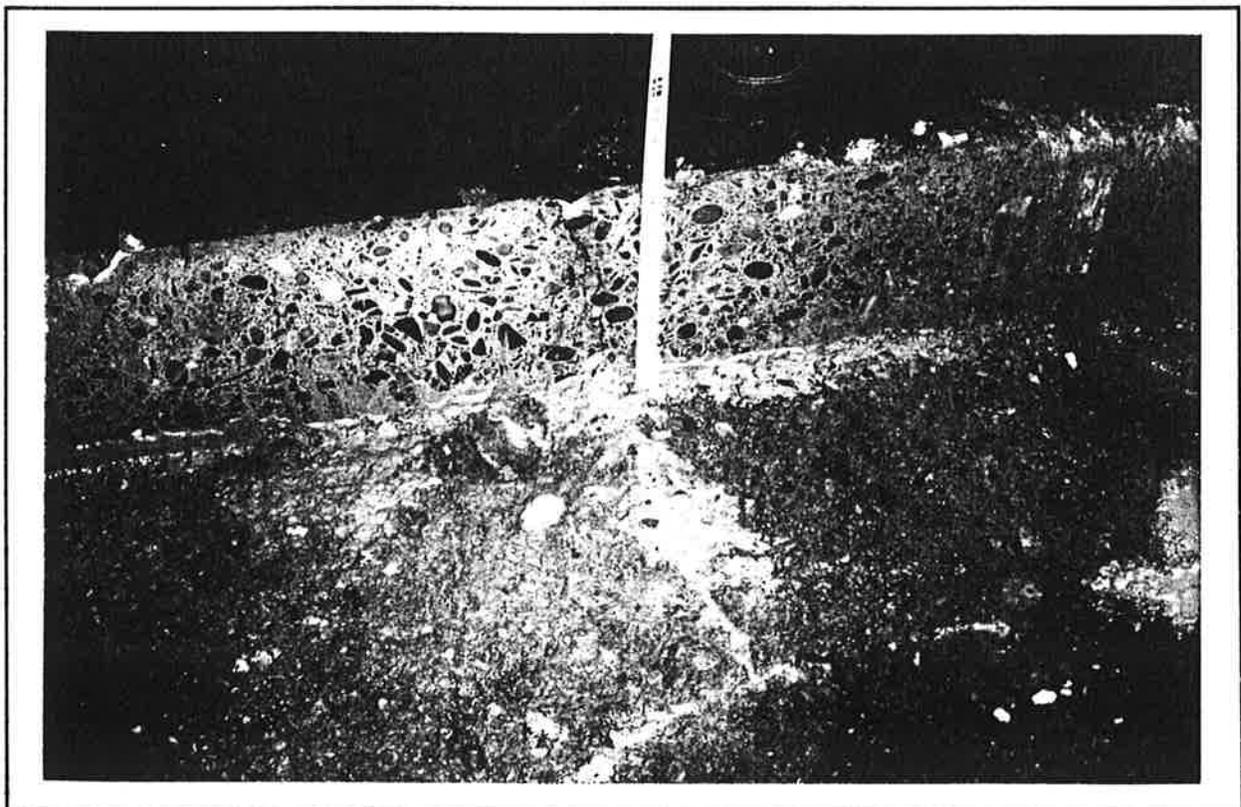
STACKING MACHINE BUILDING
